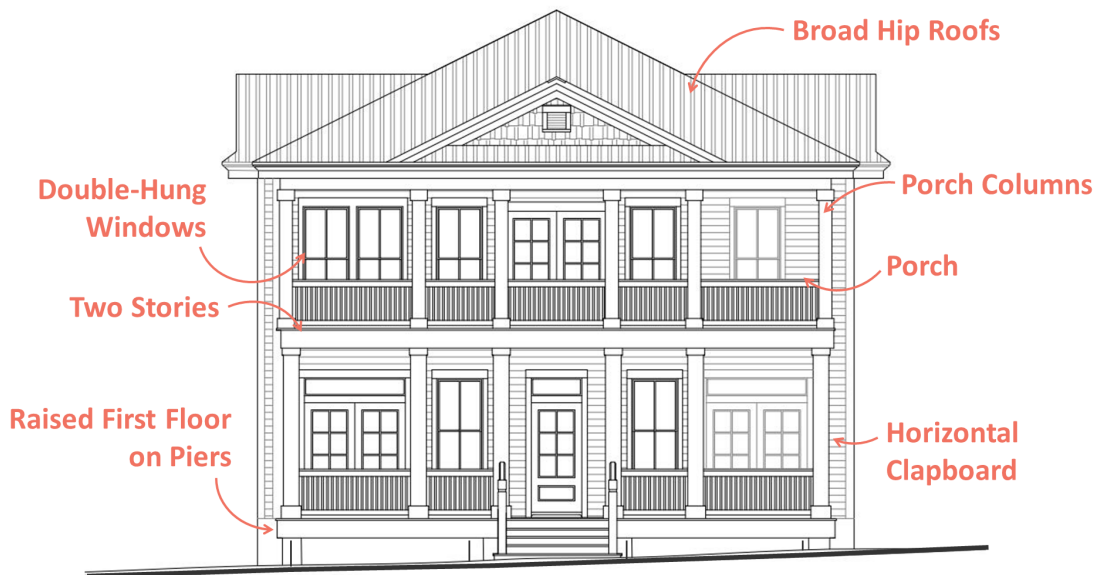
Low Country / Southeast Atlantic Coastal Architectural Style.
